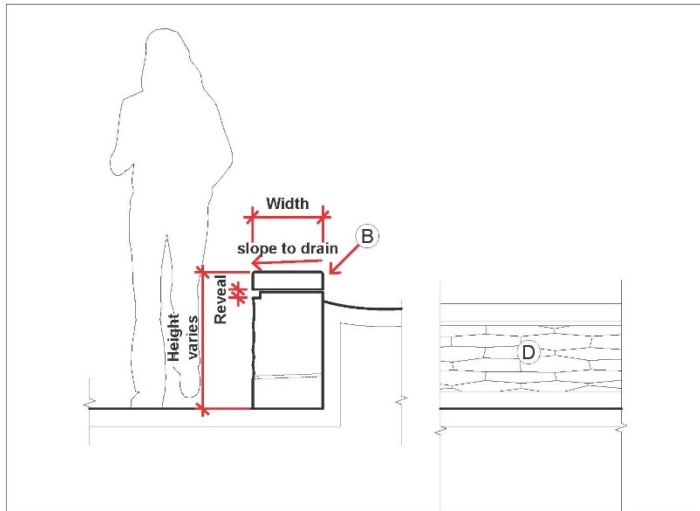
Landscape wall type 1 section and elevation
